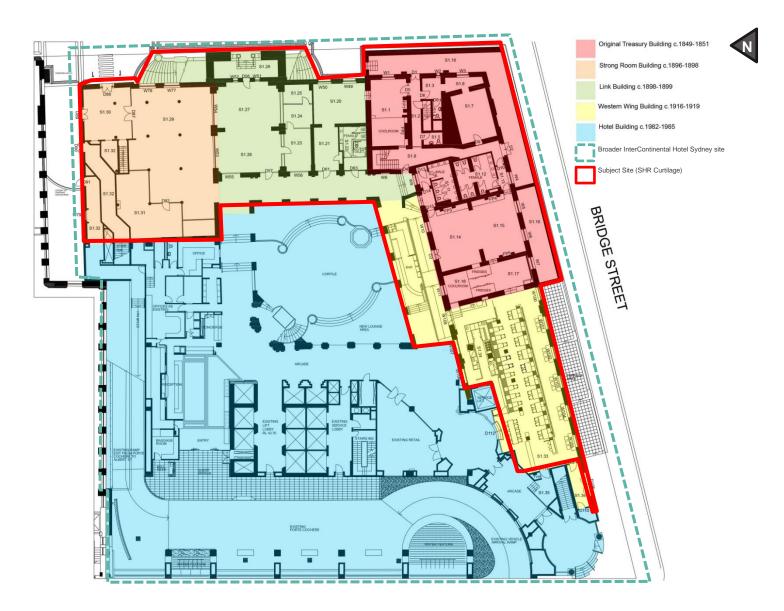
Extract of 'as built' plans showing period of construction – Basement Floor Source: Hassell Architects with Urbis annotations and overlay
